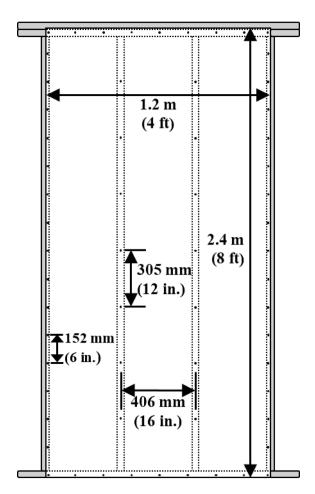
4. Typical 152/305 mm (6/12 in.) nailing pattern (62 nails) used to attach the 1.2 x 2.4 m (4 x 8 ft) wood sheathing panel to the framing members that are spaced at 406 mm (16 in.) on center.
